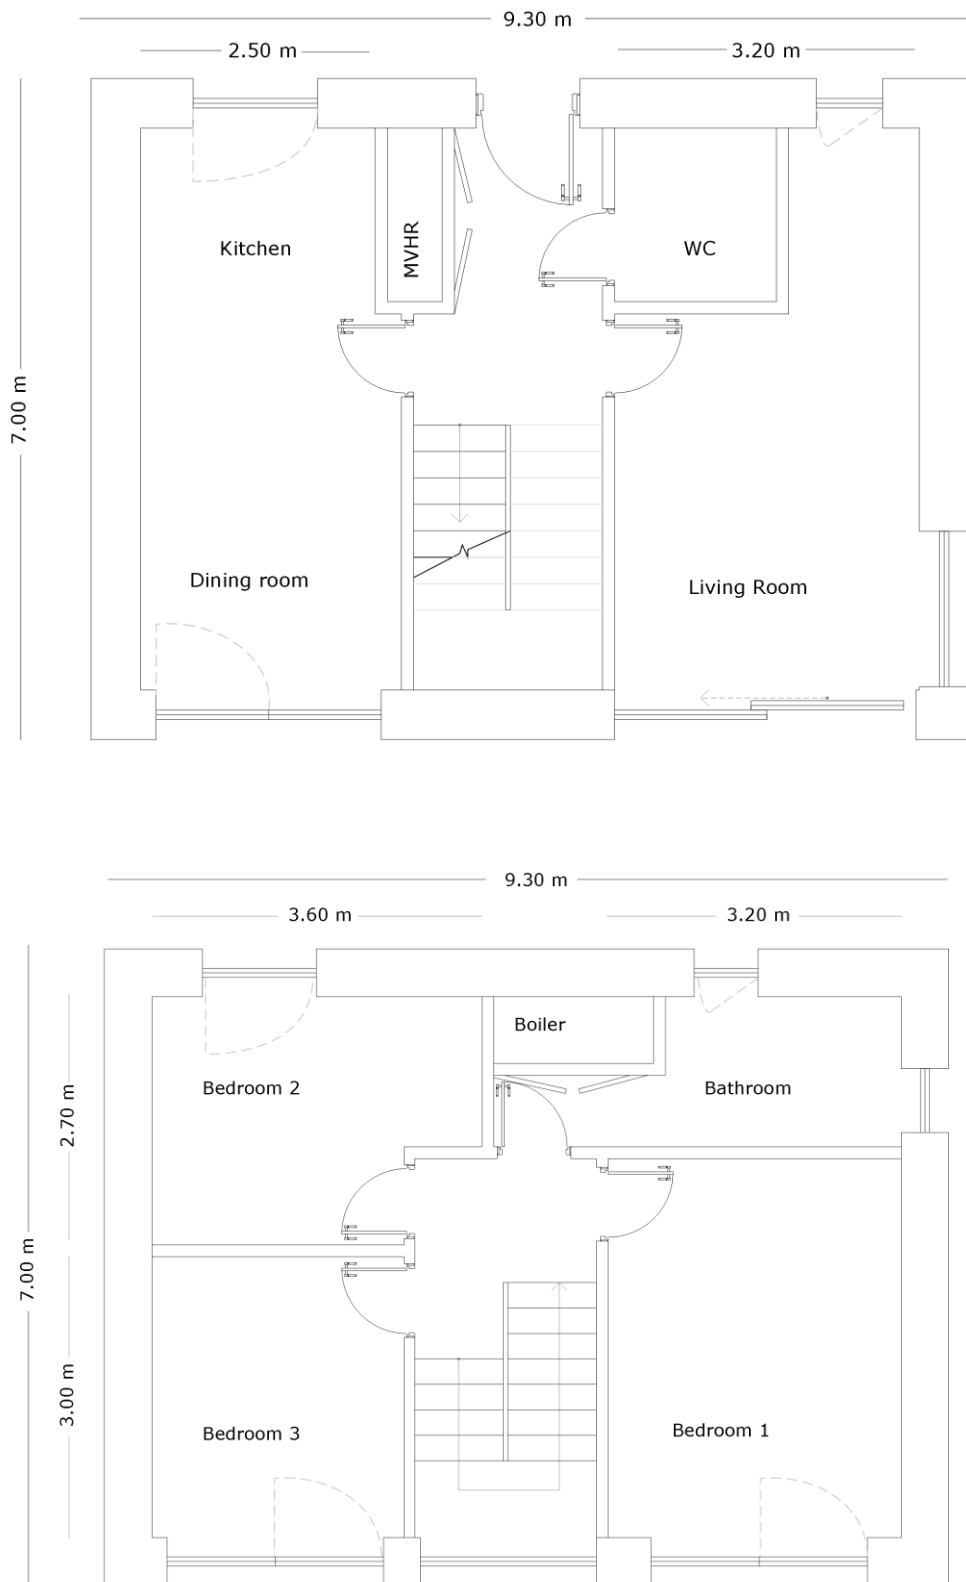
Ground floor (top) and first floor (bottom) plans of Larch House
